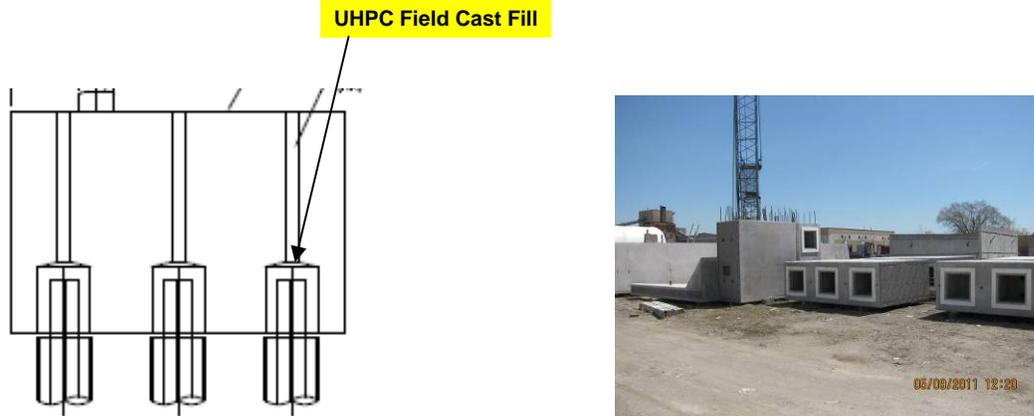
Precast Abutment for Whiteman Creek, ON¹¹
